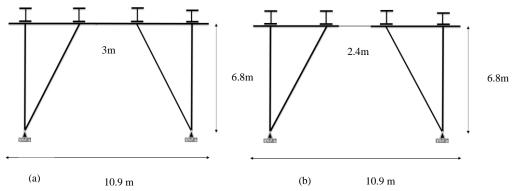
Selected EBF geometry with girders orientation: (a) for design case 1, 2 and 3, (b) for design case 4.
